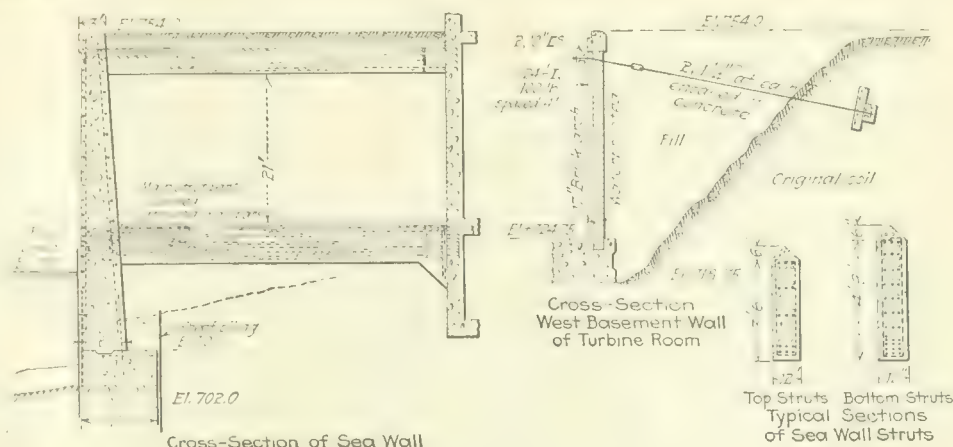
SPECIAL SEA-WALL CONSTRUCTION
